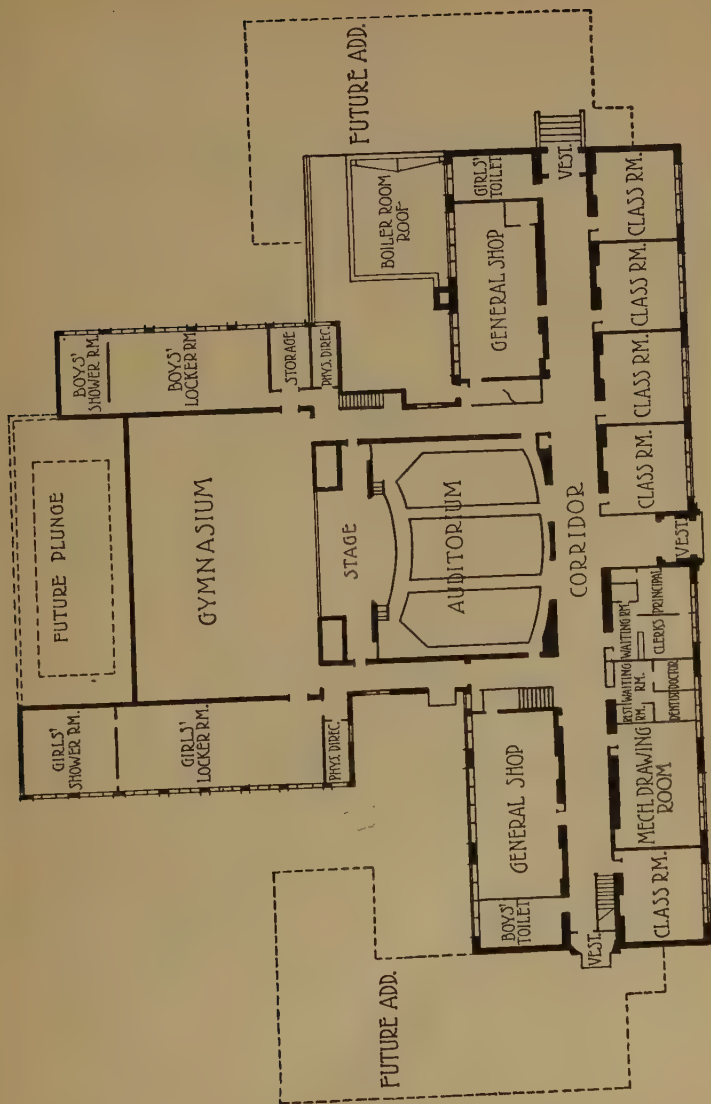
Ground-floor plan of the junior high school, Pontiac, Michigan
